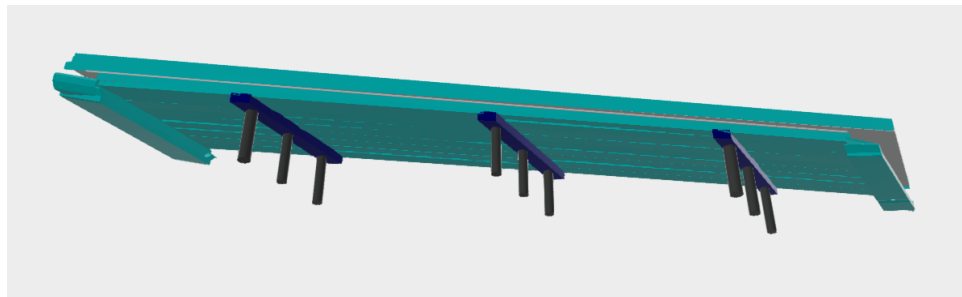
Reconstructed models of girder bridges using Bottom-Up approach
